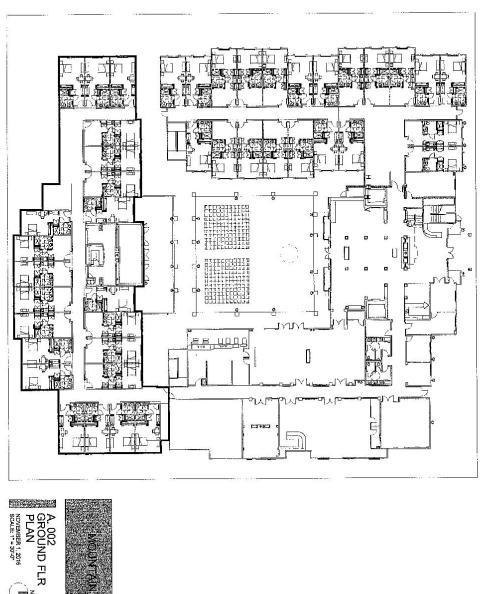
32 BED MEMORY CARE/82 BED ASSISTED LIVING GROUND FLOOR PLAN
